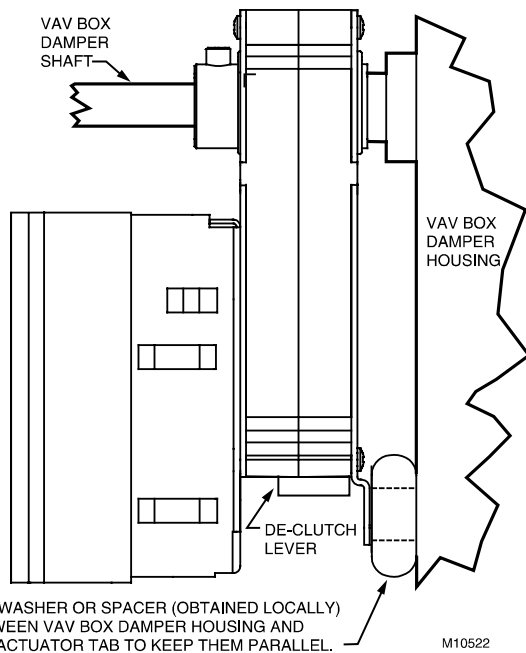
Mounting W7751H to VAV box damper housing when actuator is not parallel to VAV box damper housing.
